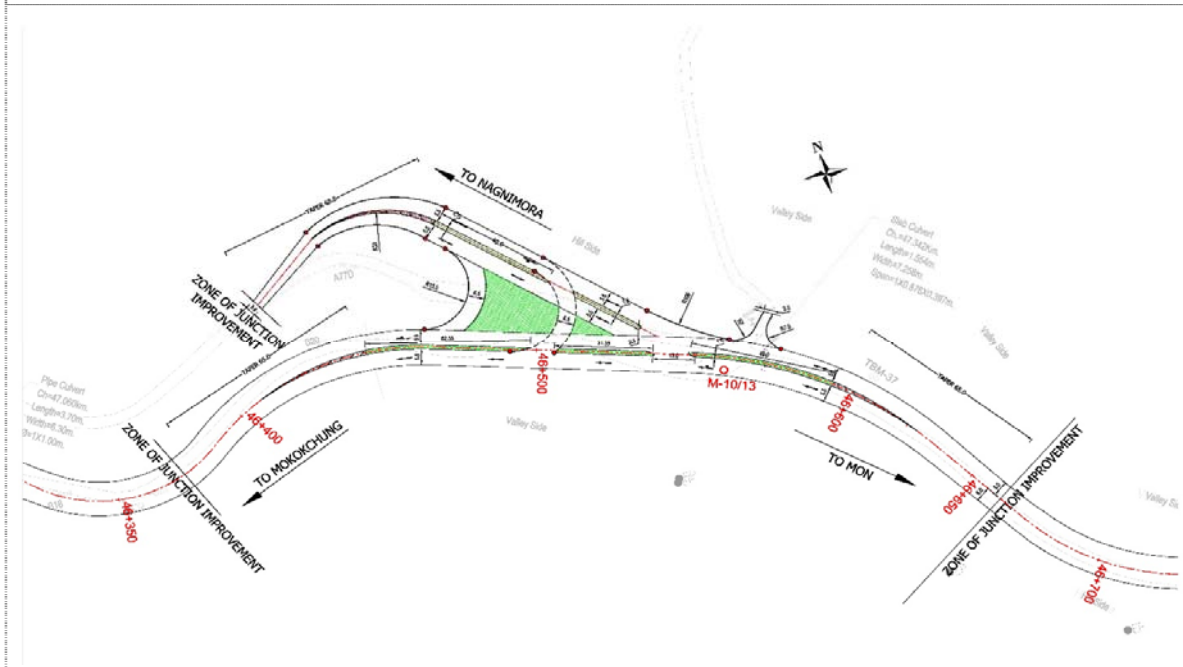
Junction Improvement at km 46+550 on M T M Road
